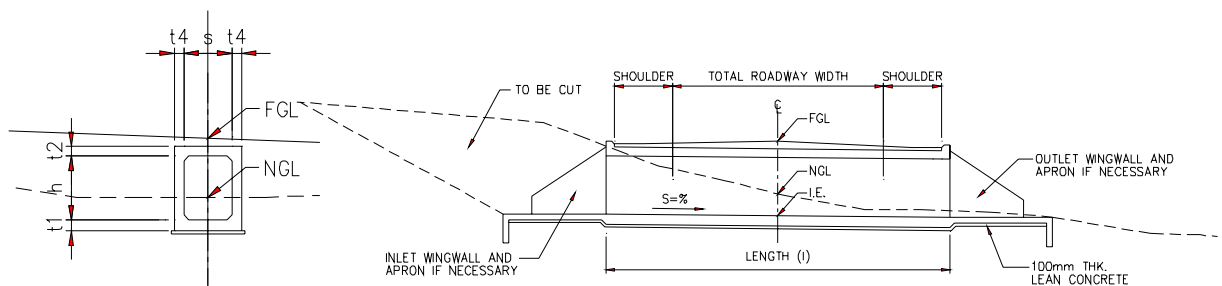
Typical Structural Detail for 1 cell Box Culvert
